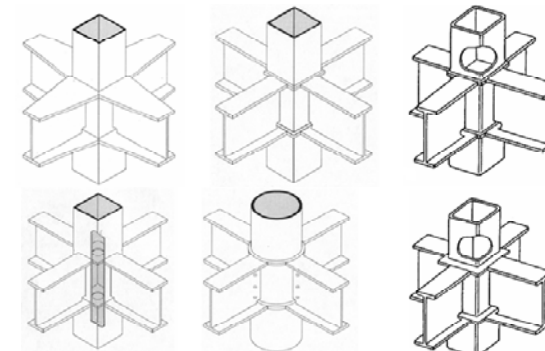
Existing connection solutions for welded beam-to-column joints
